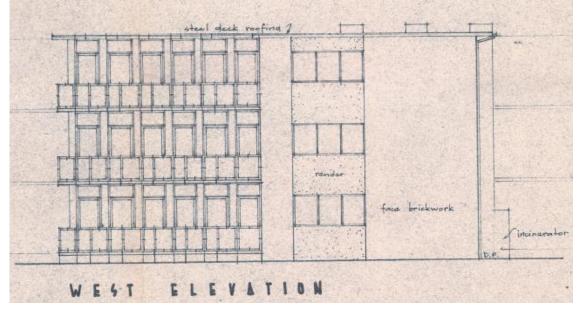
1960 drawings, front or west elevation (Source: Building File)
